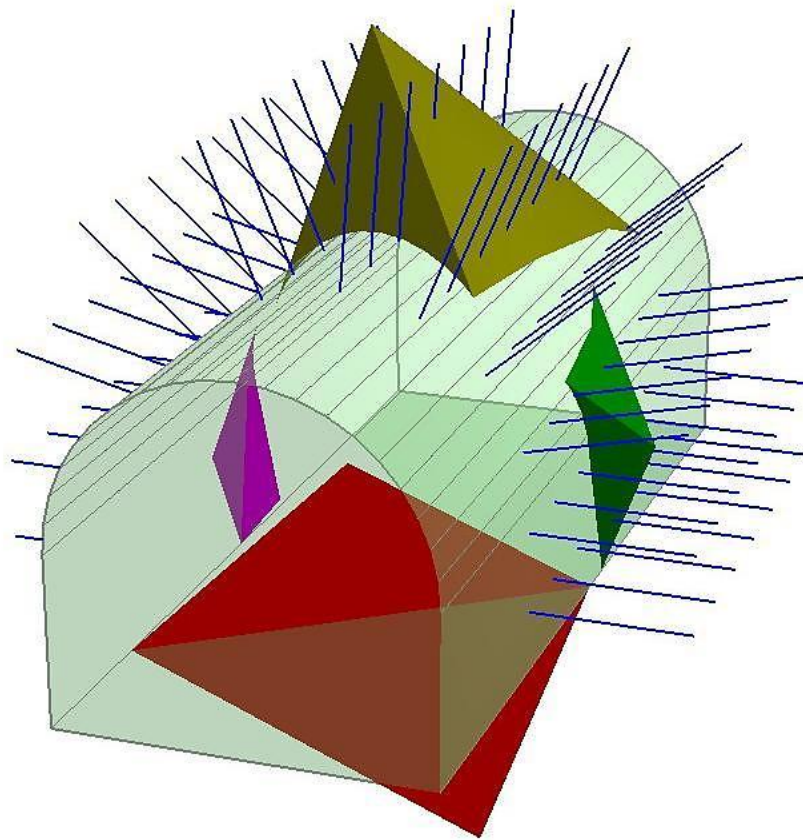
Rock bolting pattern to stabilize the roof and sidewall wedges in the tunnel example discussed earlier.
